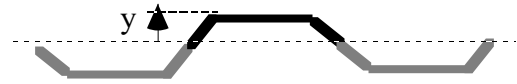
Cross section of sheet pile wall as assembly of individual sheet piles
